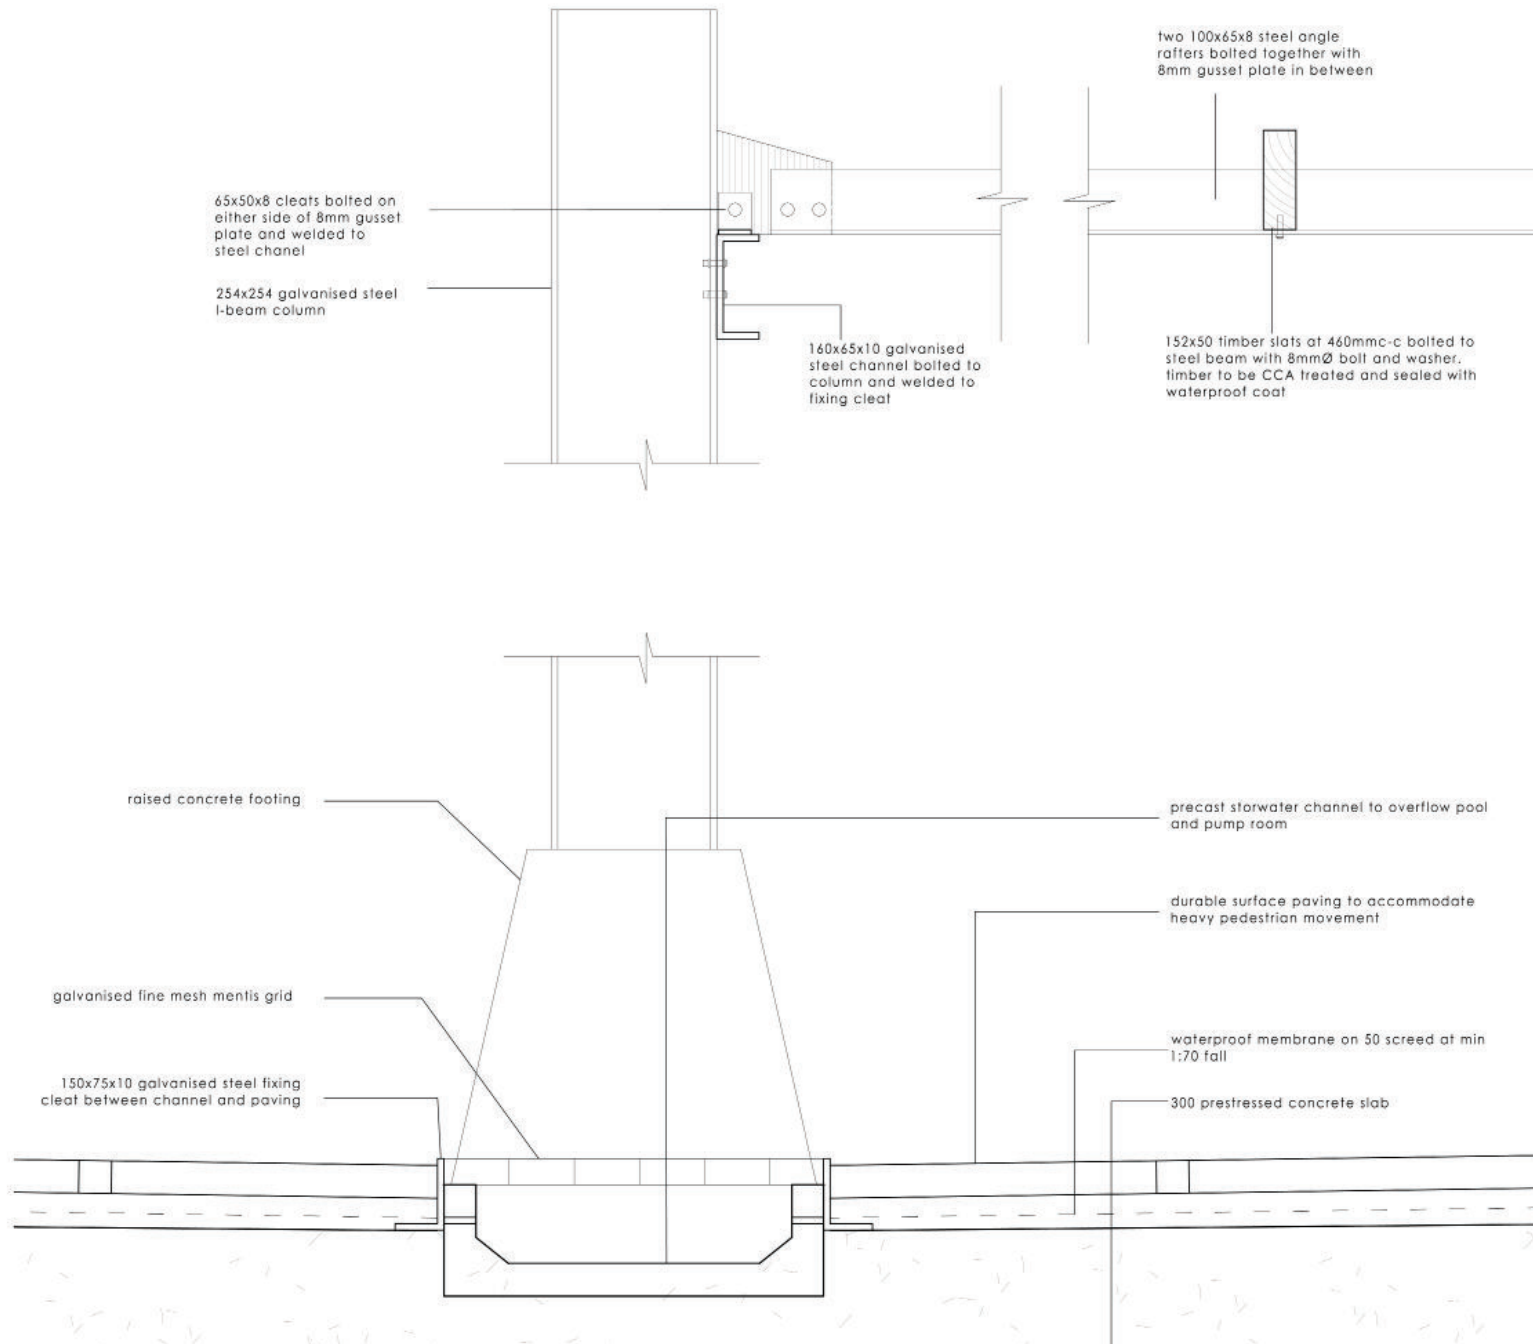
Detail C - Lightweight steel and timber pergola rising from solid masonry base (Reduced scale to fit) Author 2010
